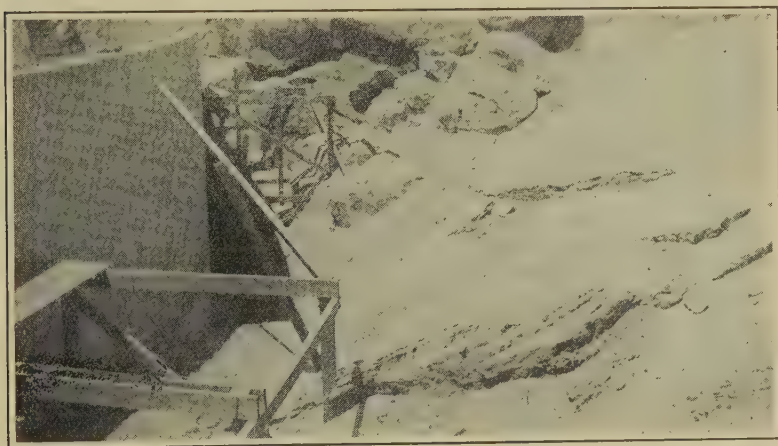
RESERVOIR FILLED WITH DEBRIS TO ELEVATION OF ABOUT 40 FT.
